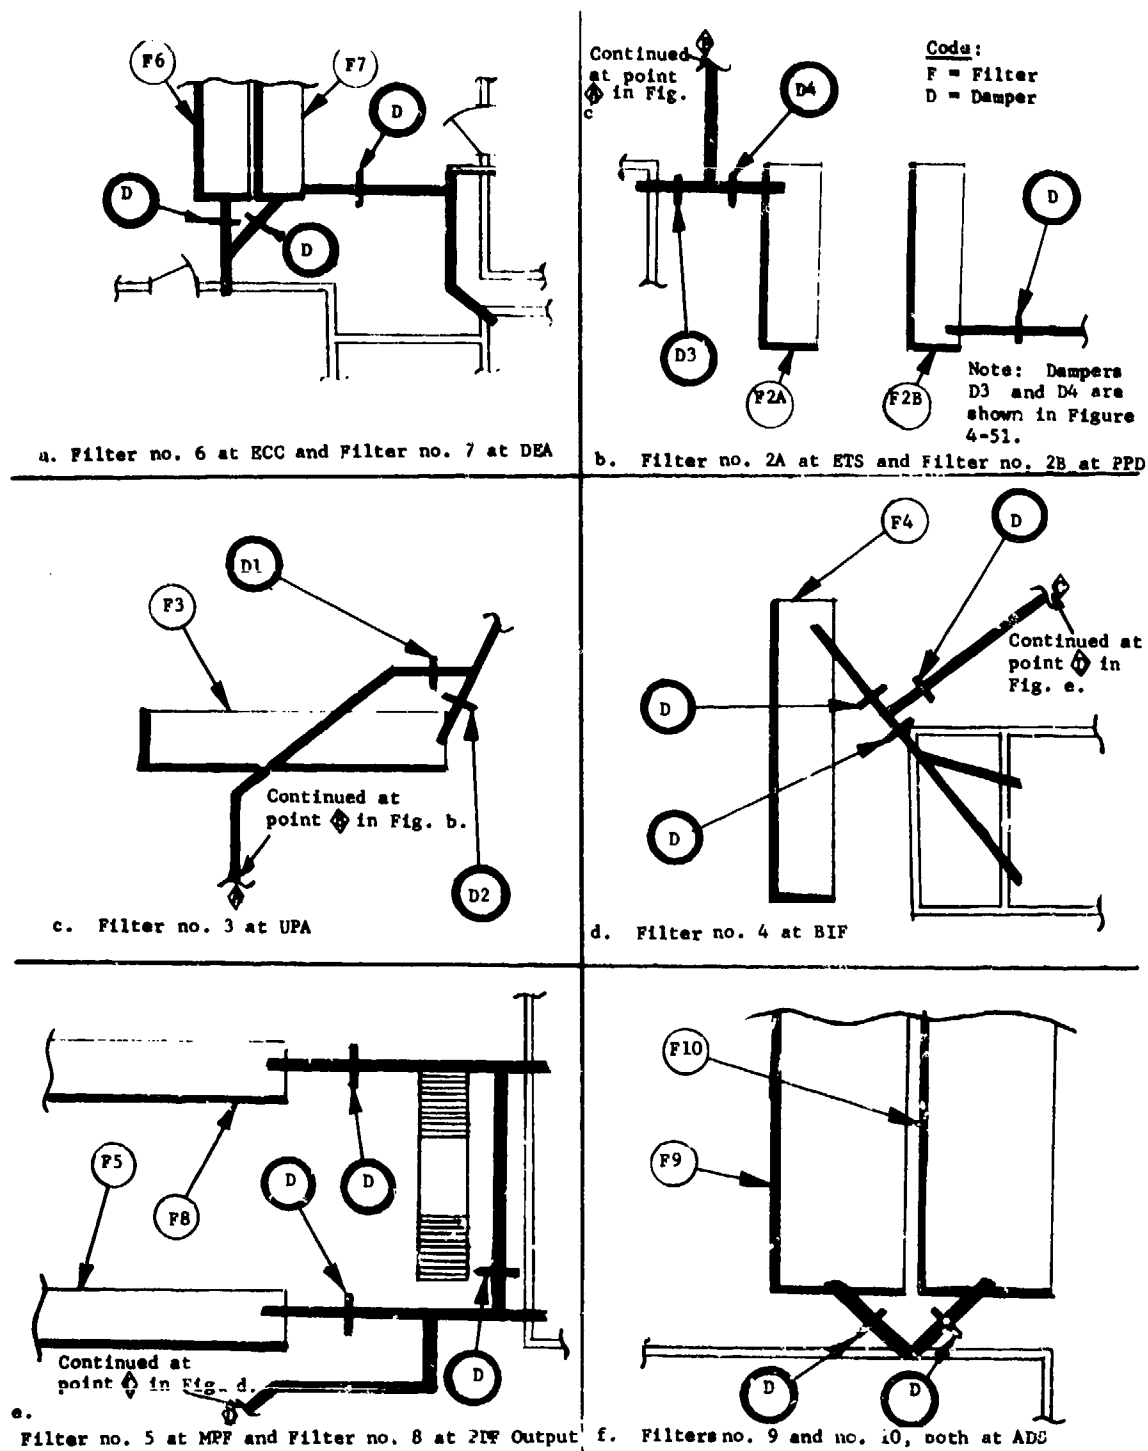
Location of Redundant Ductwork Containing Isolation Dampers At CAMDS
